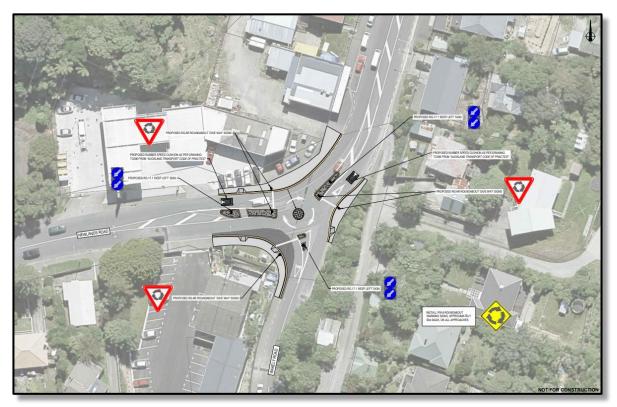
Proposed Mini Roundabout (Source: Stantec)
